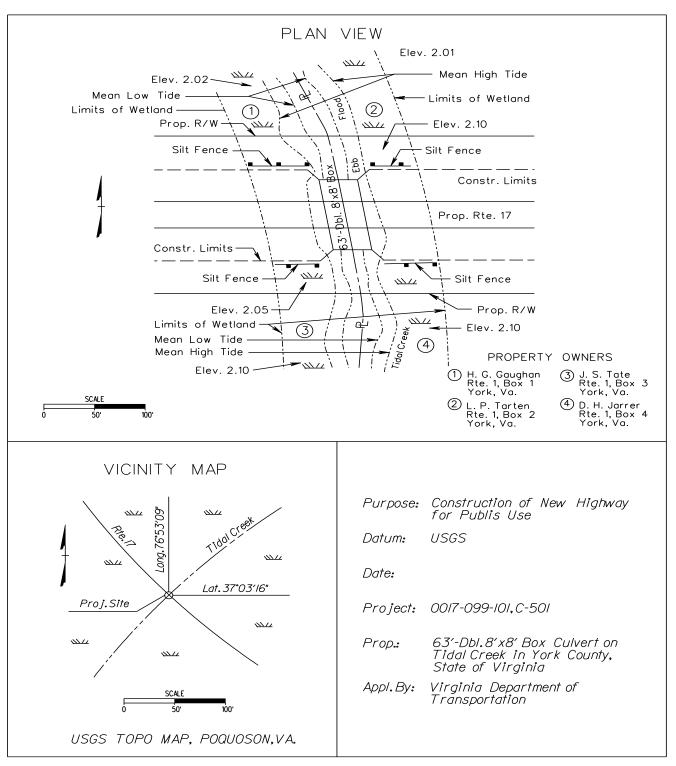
CULVERT (TIDAL) PLAN VIEW
